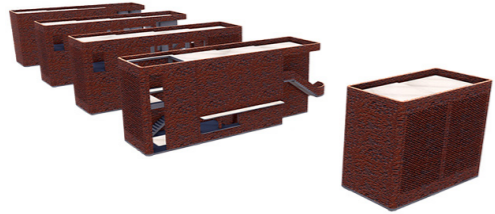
PHASE 2 - RECLAIMED BRICK INFILL (Author 2018).
